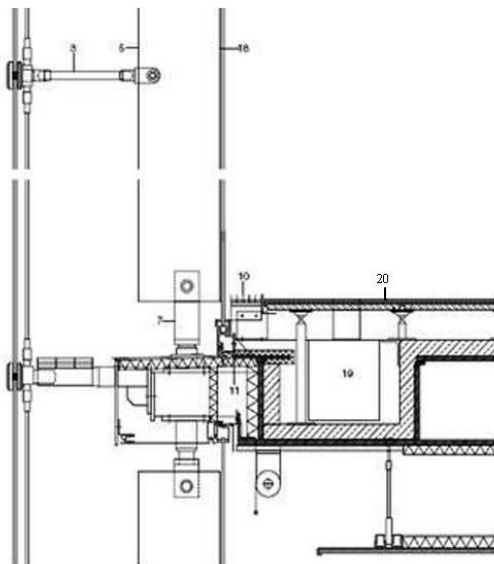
Anchorage Fittings of Curtain Wall with Partial Section (Michael, W. 1996)
